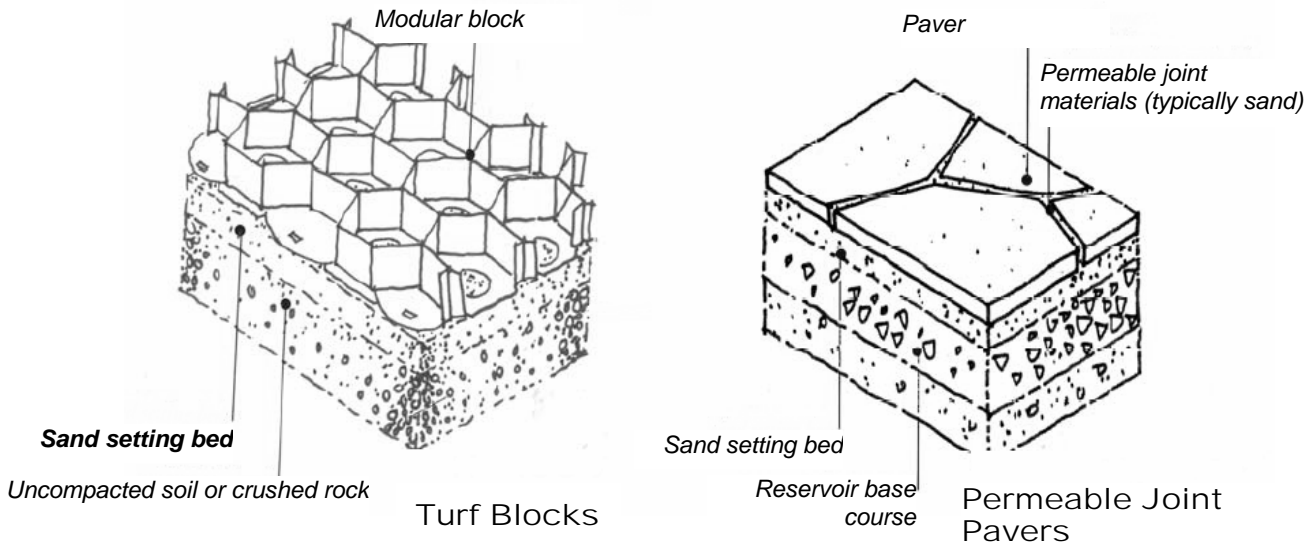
Surface and Side Views of Turf Block and Permeable Joint Pavers (Source, BASMAA. Start at the Source. 1999)
